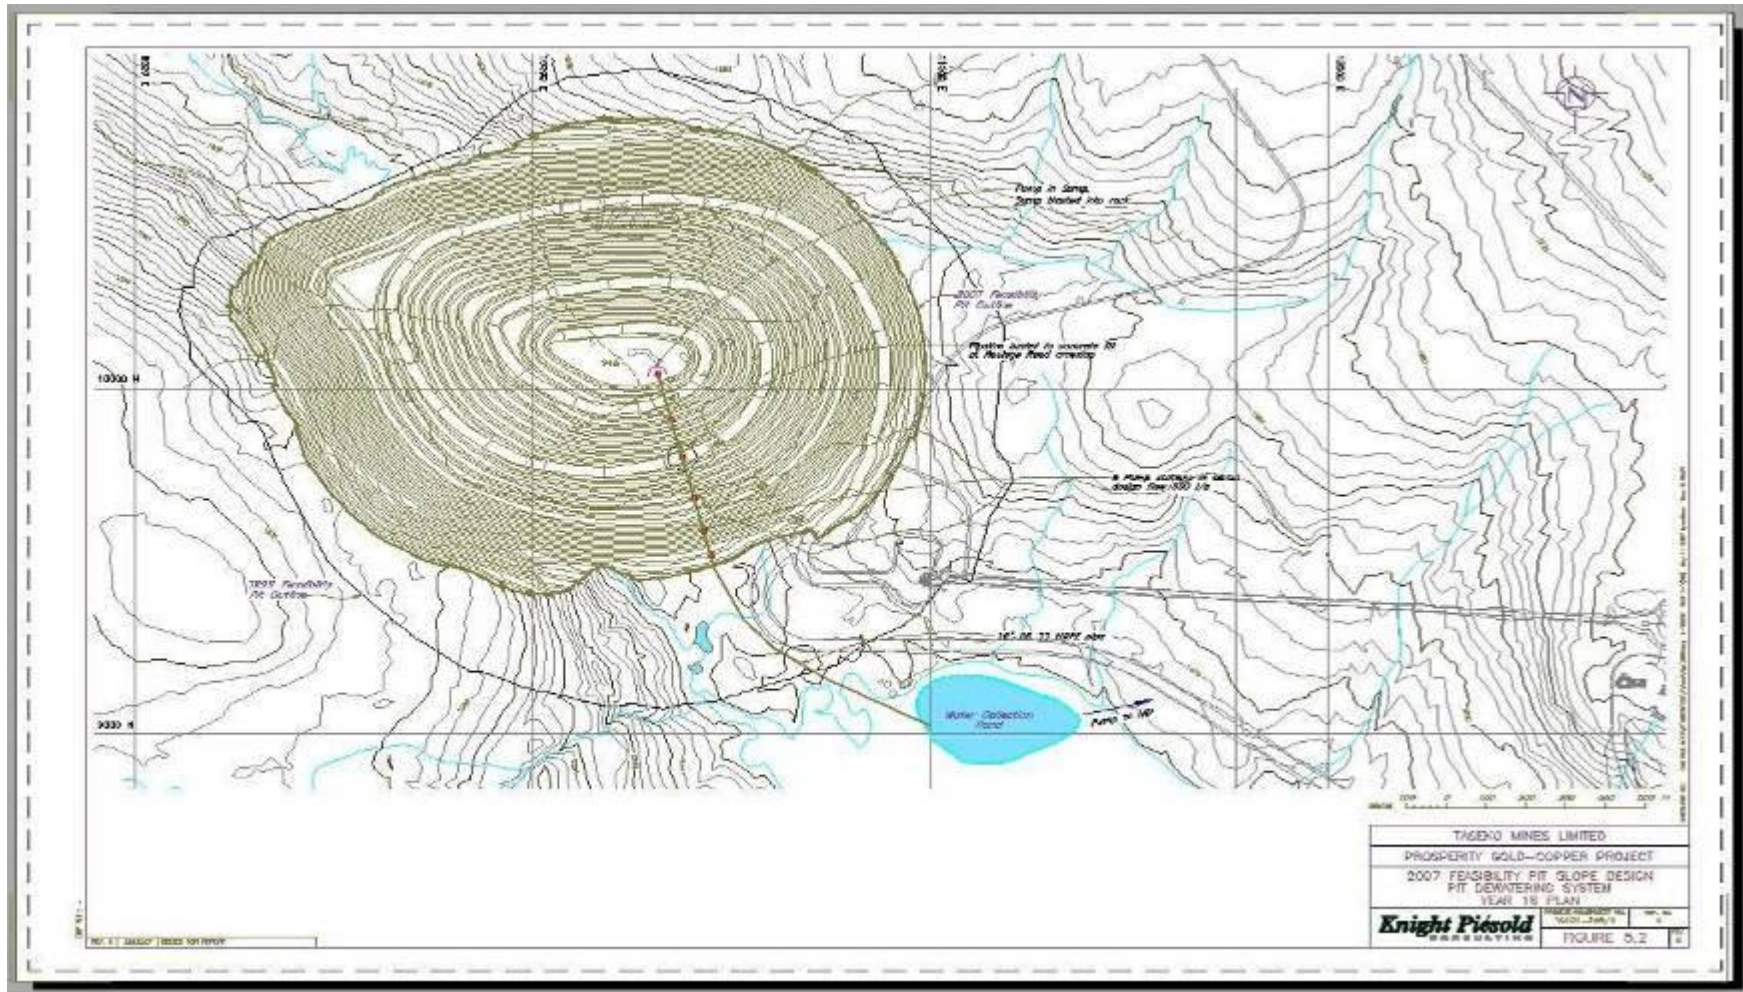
Pit Slope Design–Pit Dewatering System Year 16 Plan
